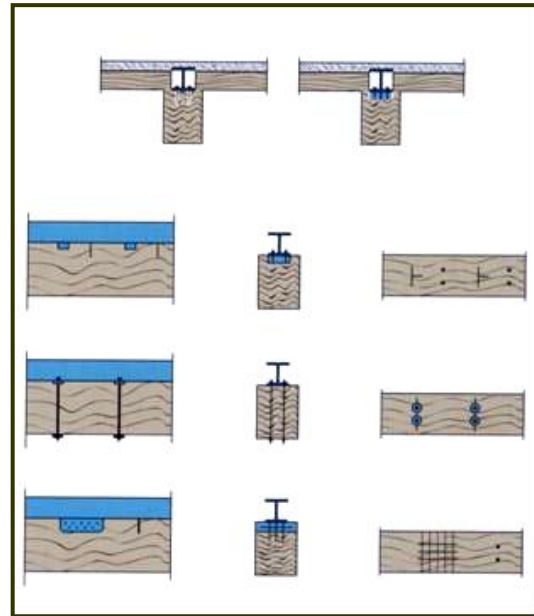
Consolidation techniques for wooden beams in floor structures, operating from the top to the bottom.
